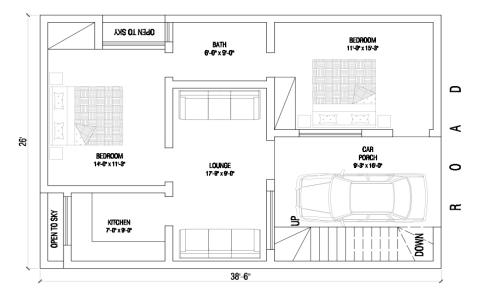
A Modern House's Basic Layout (Ground Floor Plan)
